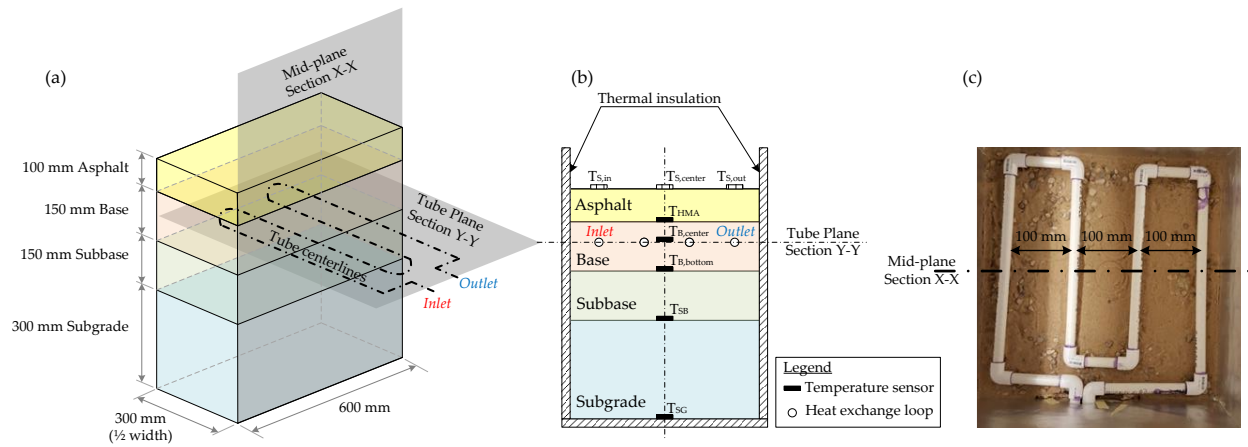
Pavement section used in the experiment: (a) half-width 3-D view, (b) mid-plane cross-section X-X, and (c) the used heat exchange loop at tube plane (section Y-Y).
